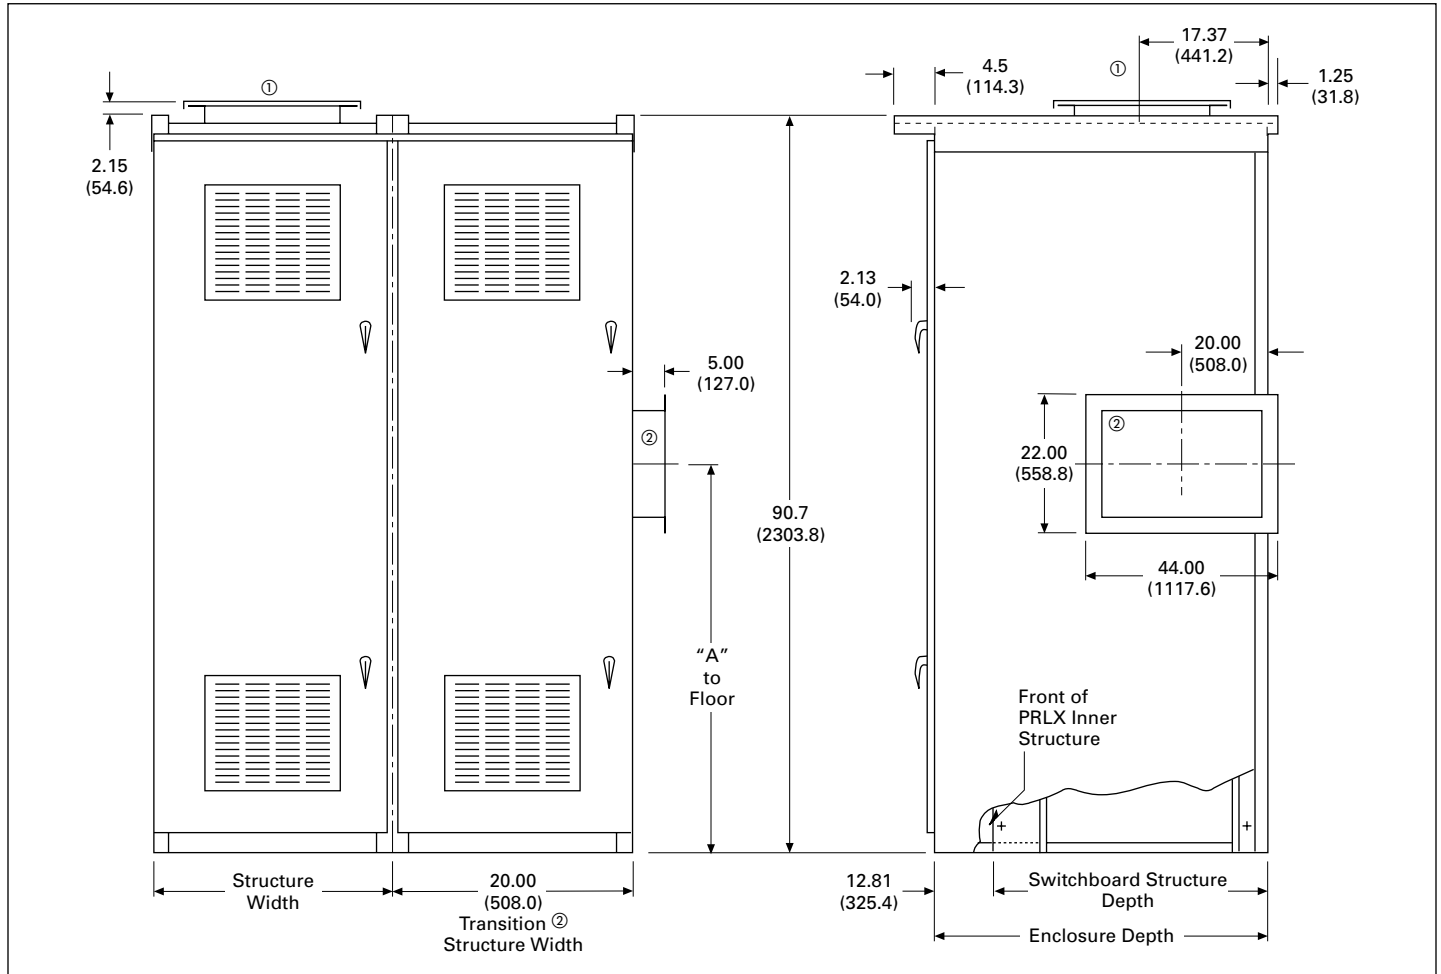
Front-Access—Non-Walk-In with Flat Roof—Dimensions in Inches (mm)
